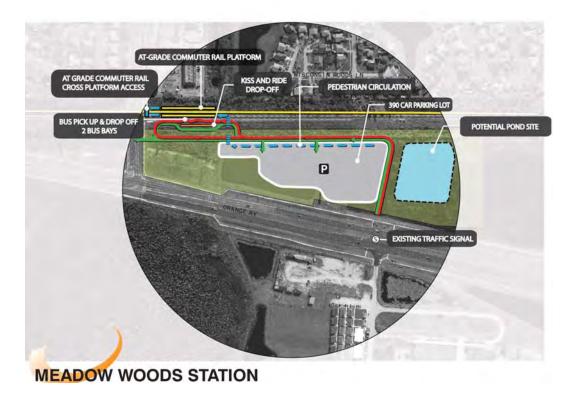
Conceptual Station Site Plan – Meadow Woods
